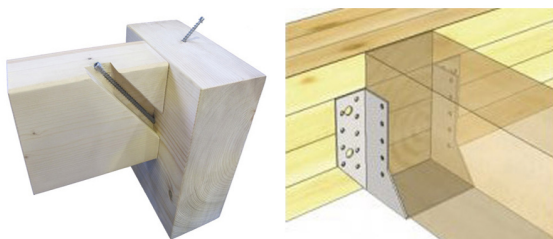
typical joist connections for timber structures. Left: pair of full thread screws, Right: joist hanger
